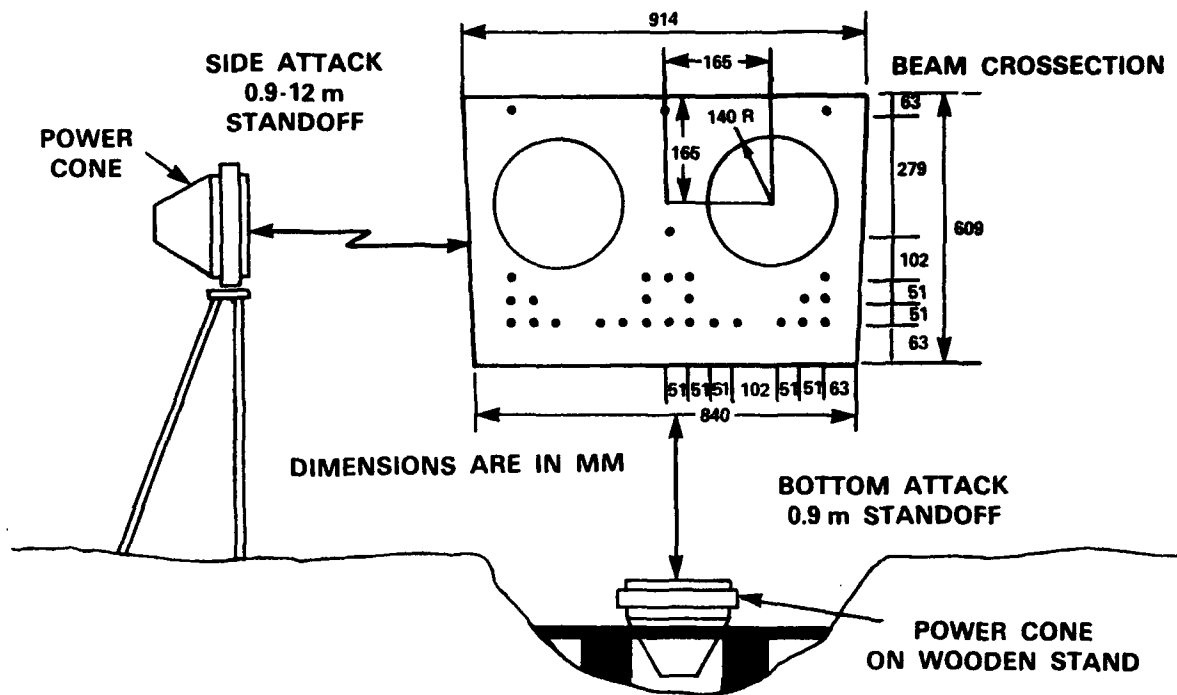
Cross-section of pre-stressed concrete beam used in study.
